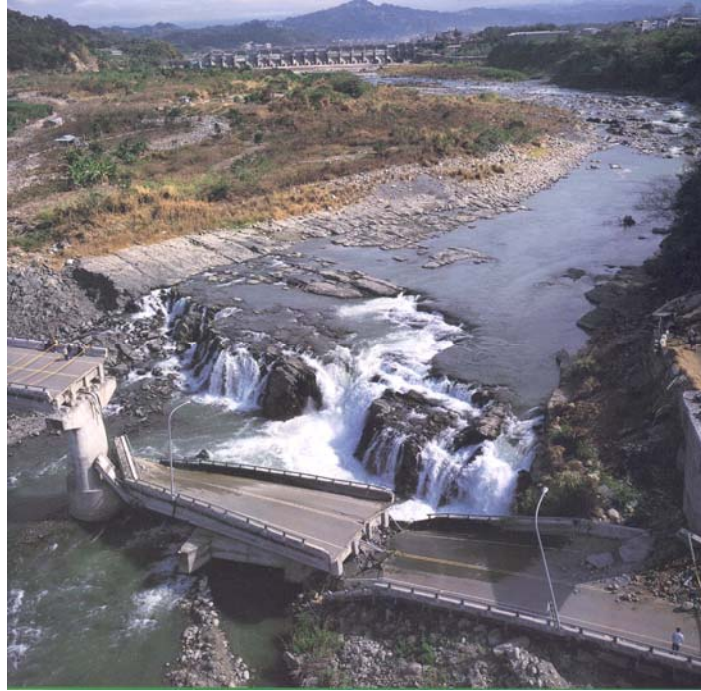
View of fault rupture adjacent to bridge downstream of dam showing formation of falls in river and damage to bridge structure
